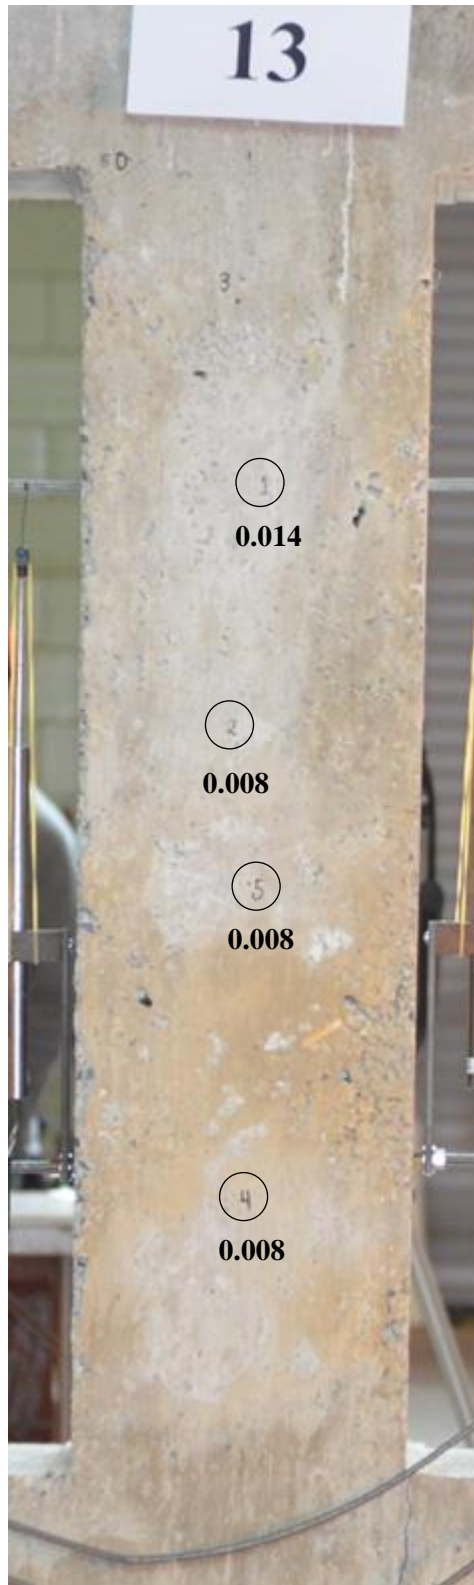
Cracks on east face of TS02 at Load Step 13
